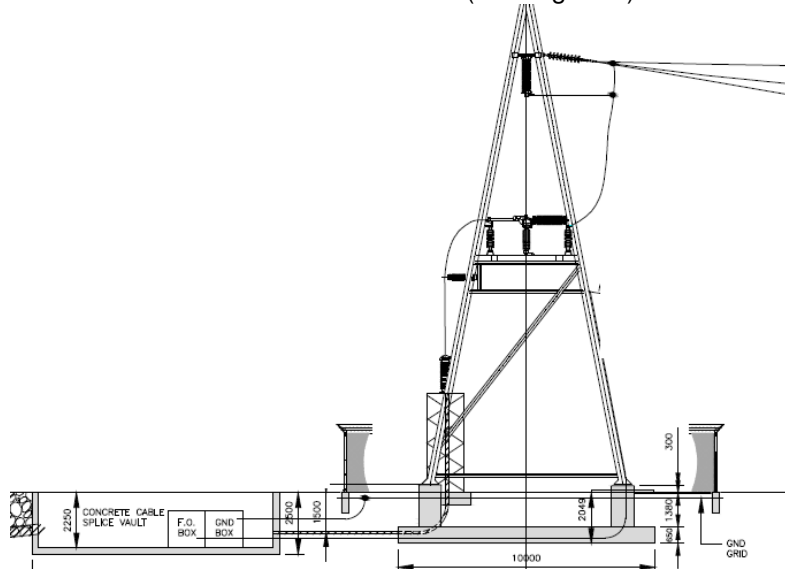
Cable Vault and Outdoor Termination - Conceptual Arrangement
